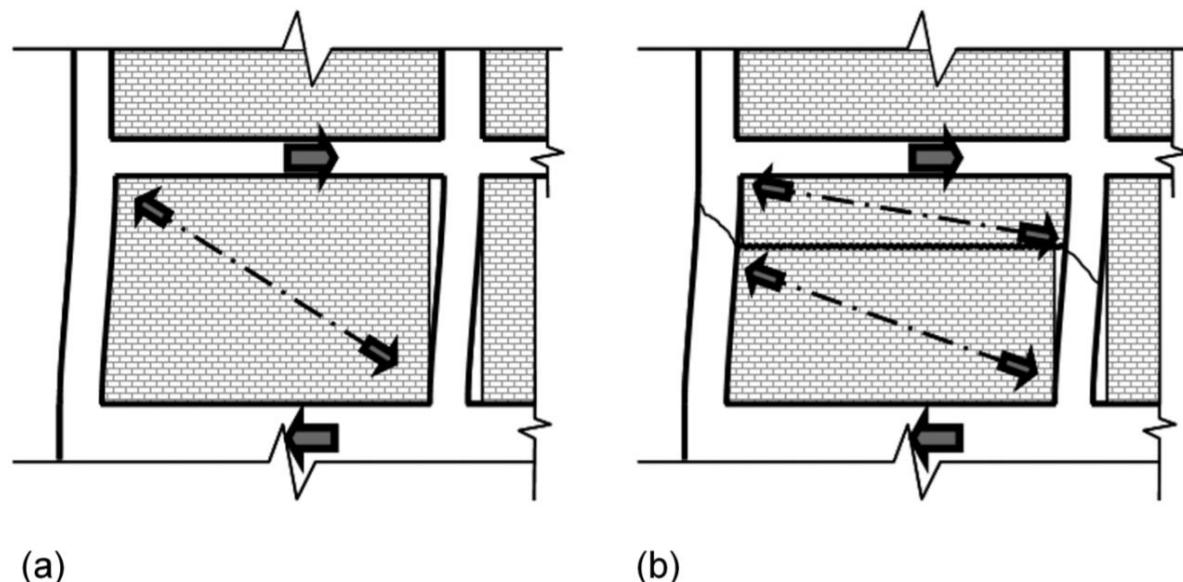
Force transmission before (Fig. 15 a) and after (Fig. 15 b) shear failure of the infill panel.
